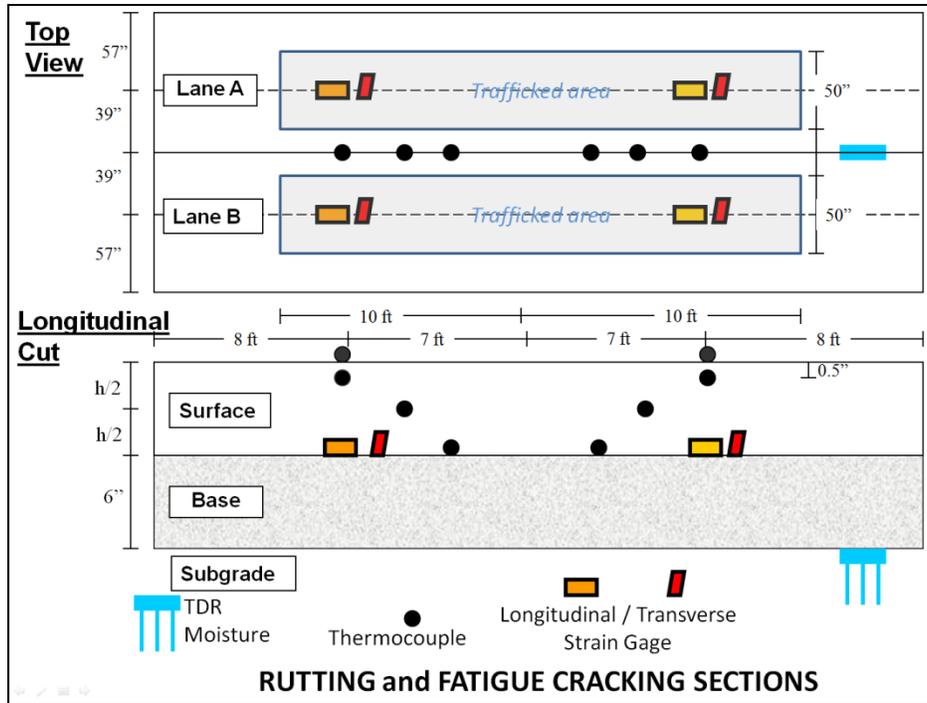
Instrumentation to Be Installed in the Rutting and Fatigue Cracking Sections.
